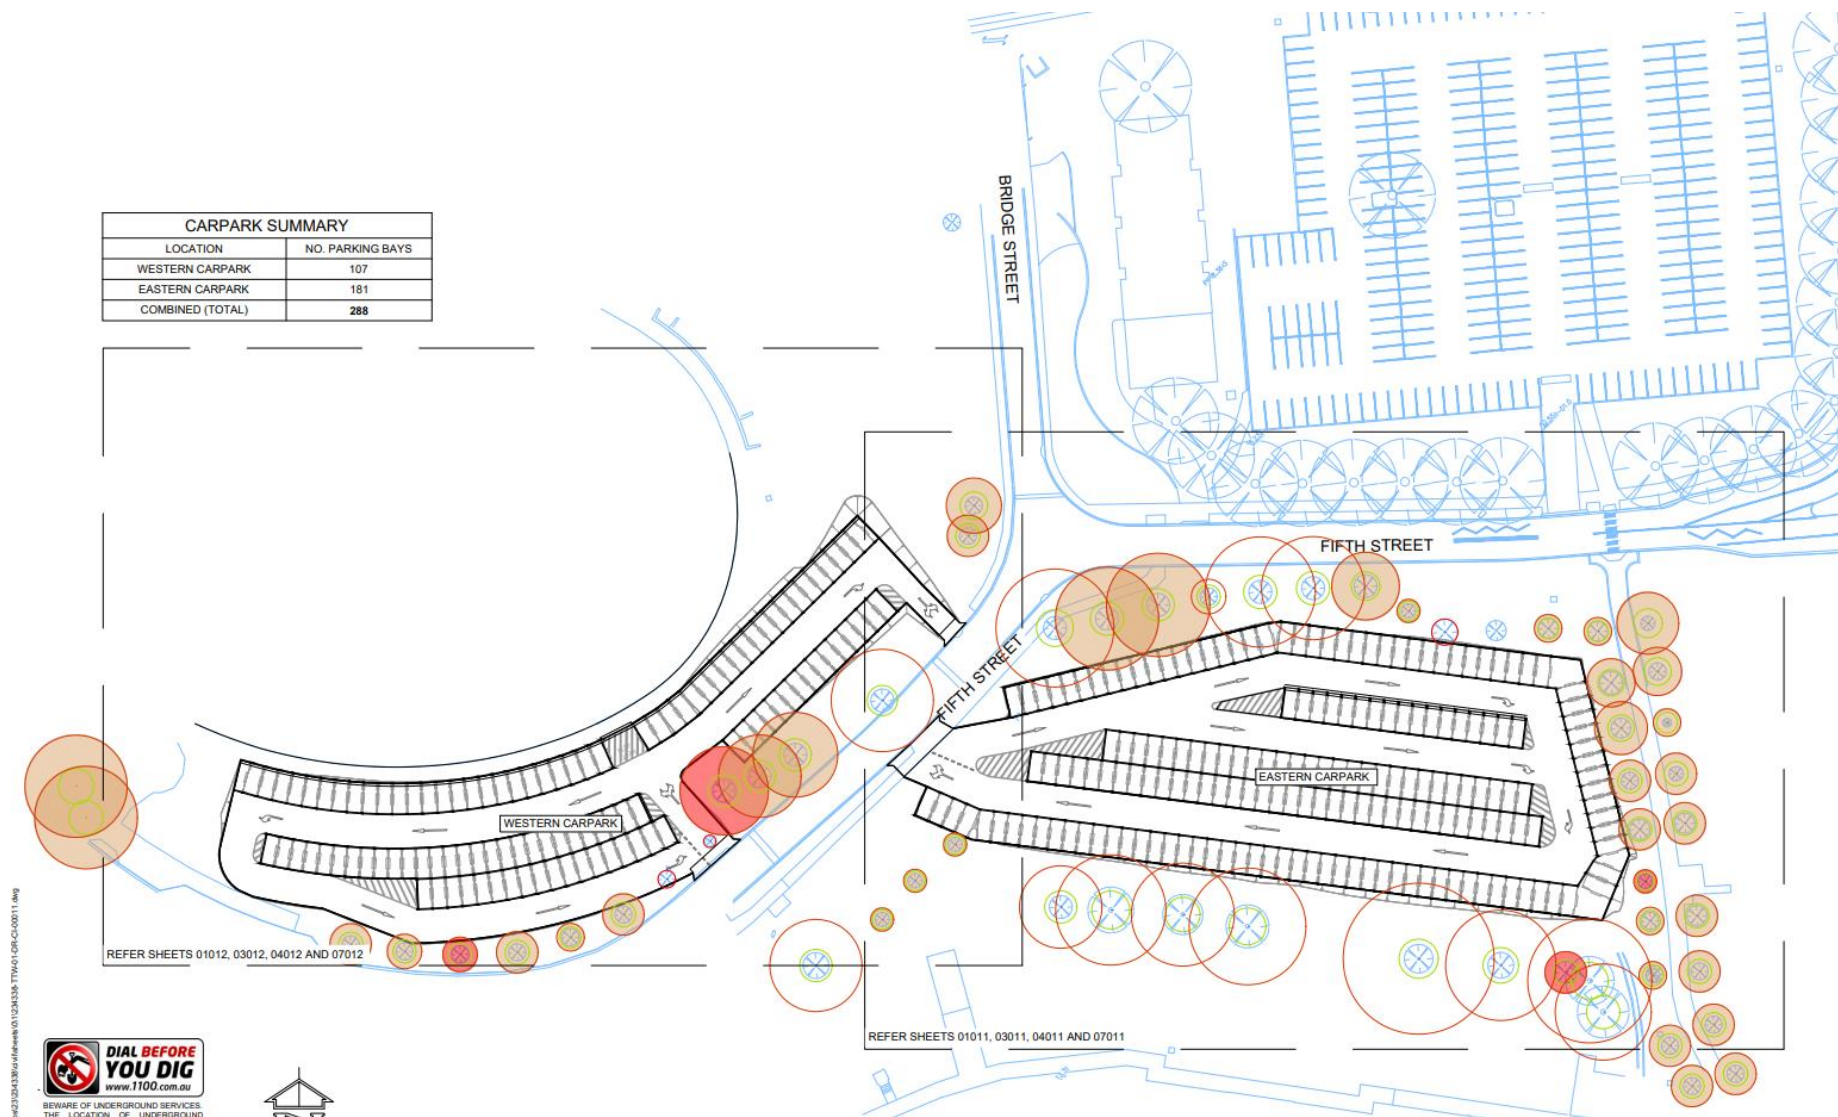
General Car Park Arrangement Plan. Source: TTW 2025
